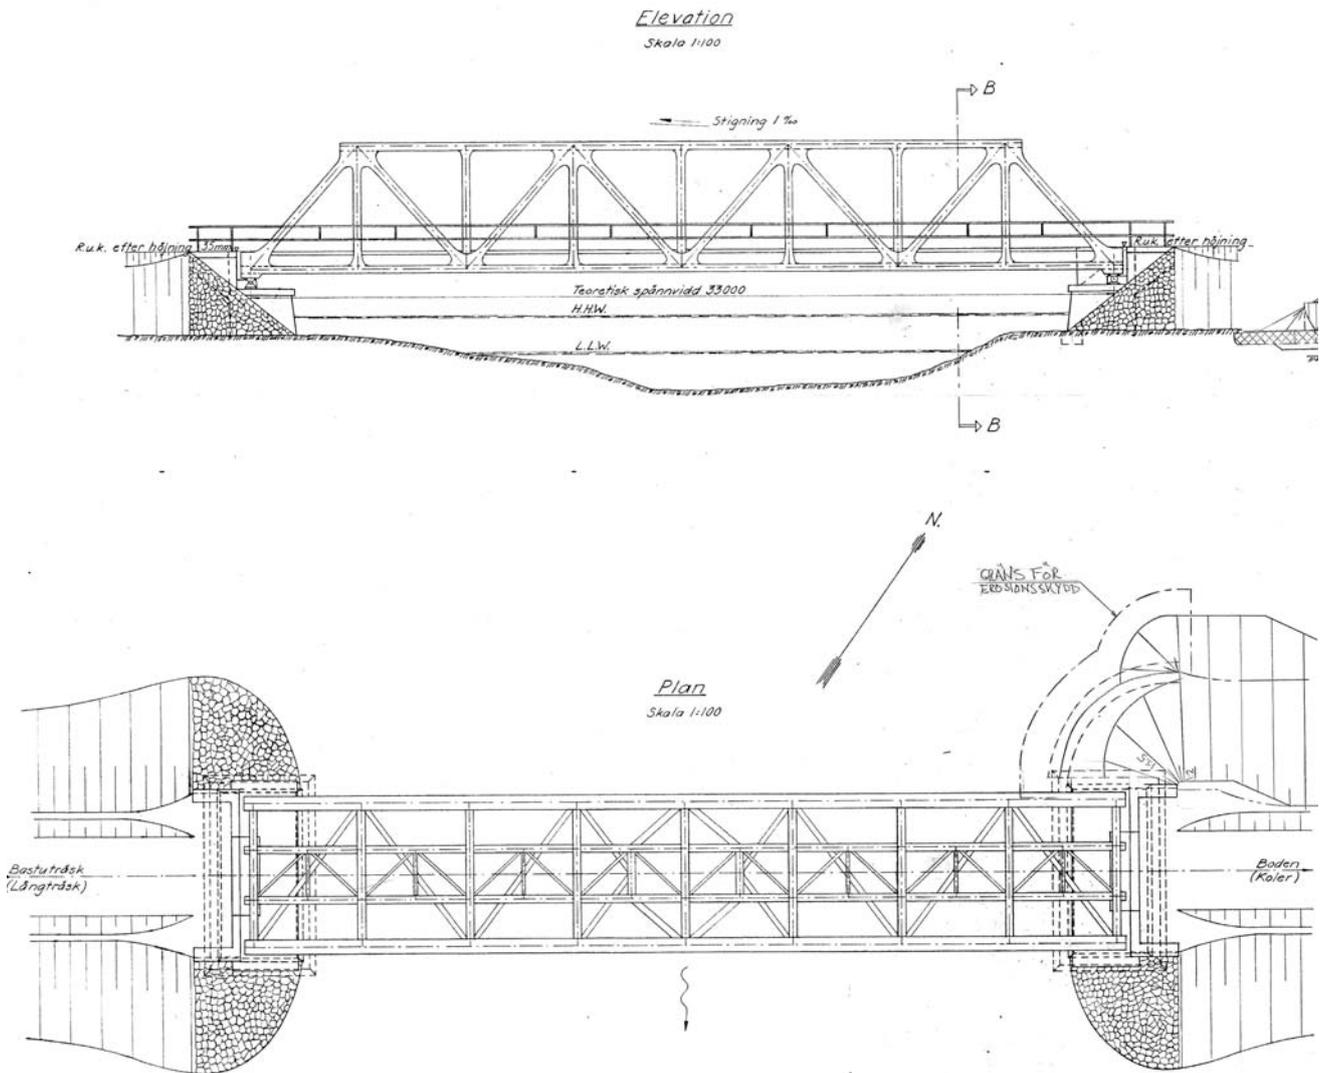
Elevation and Plan. Original drawing from 1957 of the Åby Bridge, span length 33 m. No 3500-1940-1, km 1049+50.
